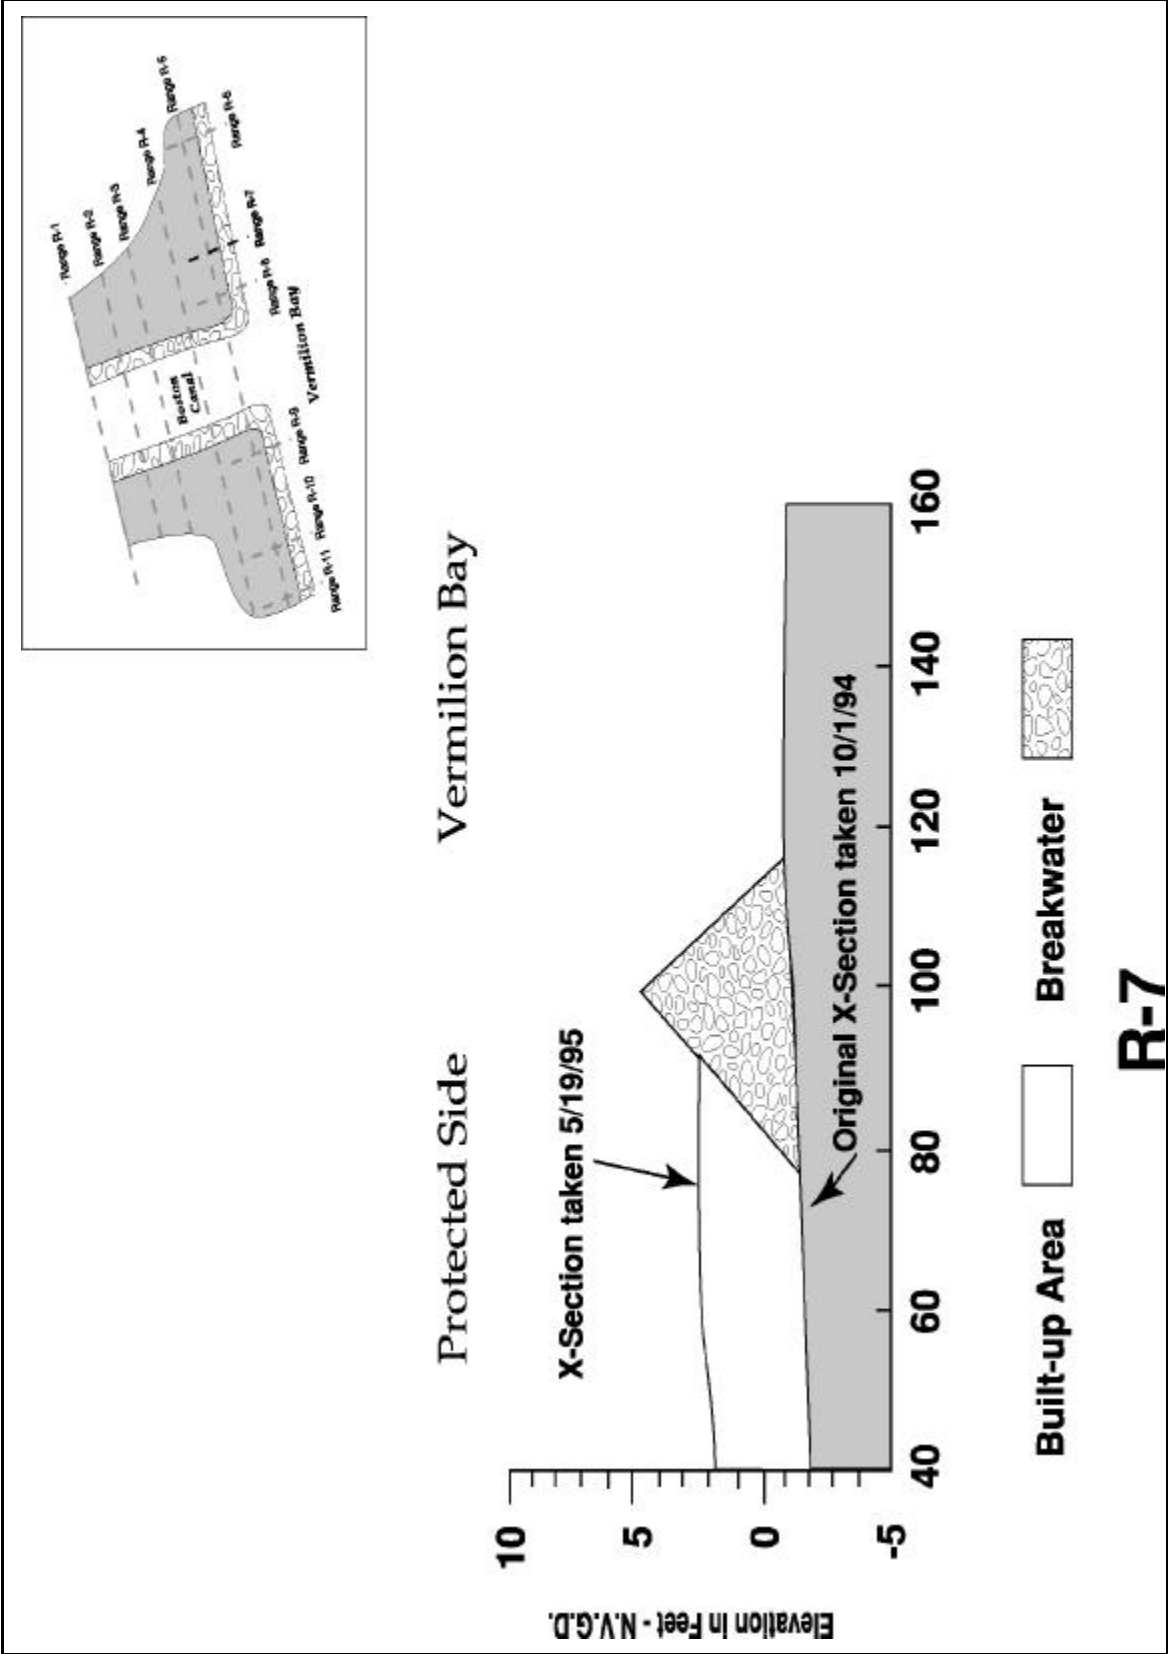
Boston Canal/Vermilion Bay Shoreline Protection (T/V-09) elevational profile of north-south transect R-7 showing accretion.
